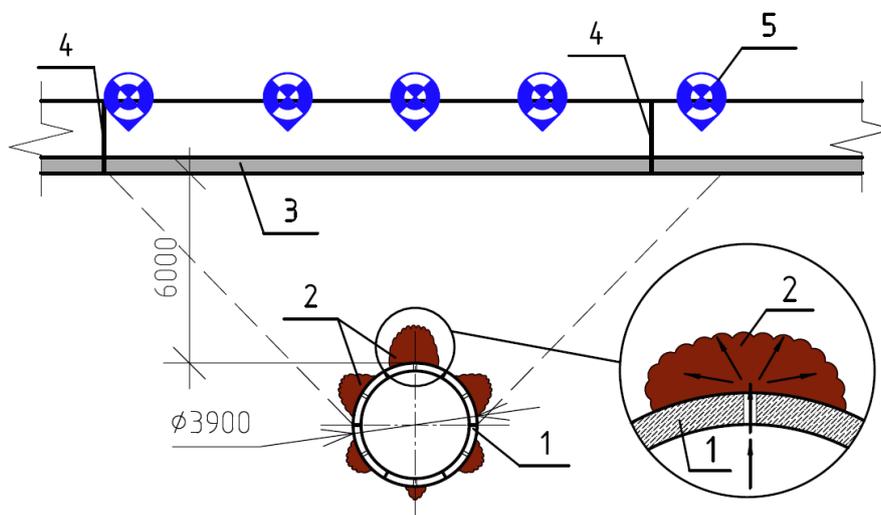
Scheme of controlled compensation grouting: 1 – tunnel under construction; 2 – injected grouting compound; 3 – operating metro section; 4 – expansion joints; 5 – hydrostatic levels.
